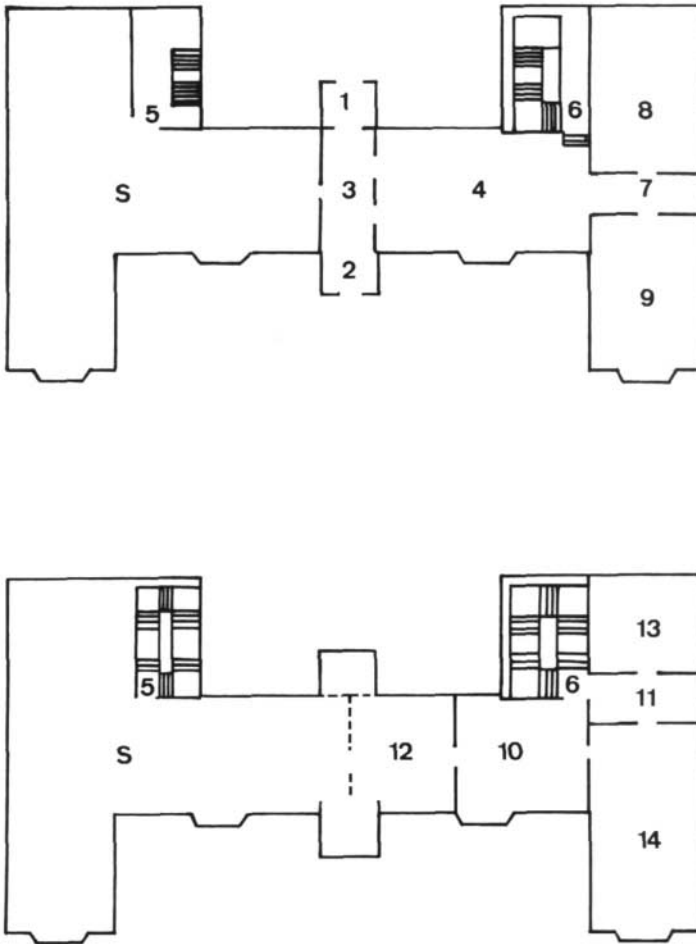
Montacute, outline plans of ground and first floors and access map before the 1786 corridor was added, rooms named from an inventory of 1638 (Rogers 1991). Ground floor: S for service rooms; 1 Rear porch; 2 Front porch; 3 Screens passage; 4 Great hall; 5 South stairs; 6 North stairs; 7 Lobby; 8 Parlour chamber; 9 Parlour. First floor: S for secondary rooms; 10 Withdrawing room; 11 Lobby; 12 Best chamber; 13 Garden chamber; 14 Dining room. Second floor: both stairs lead to 15, the Long gallery, which gives on to four chambers
